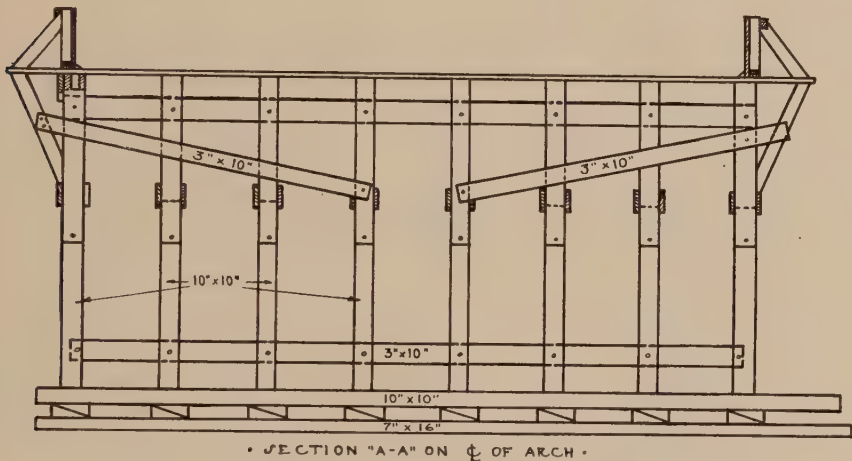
Cross-section of centering for 60-ft. arch shown in Fig. 213
